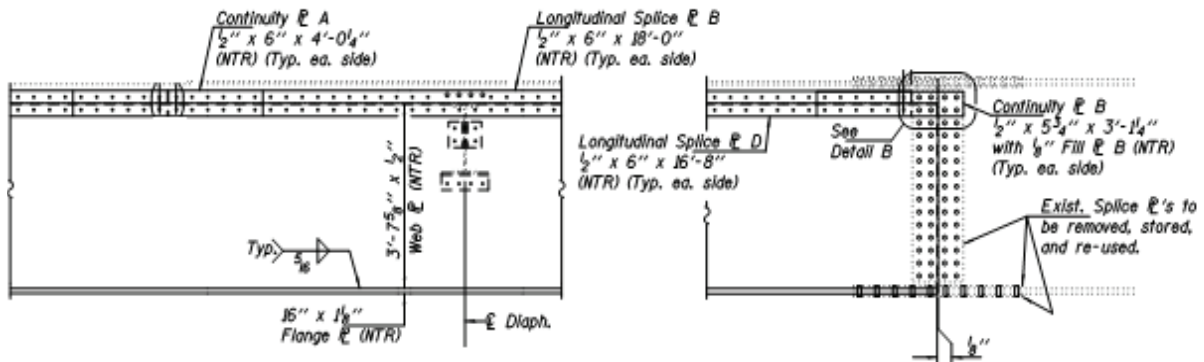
Sample bolted horizontal and vertical web splice detail (Illinois DOT)
